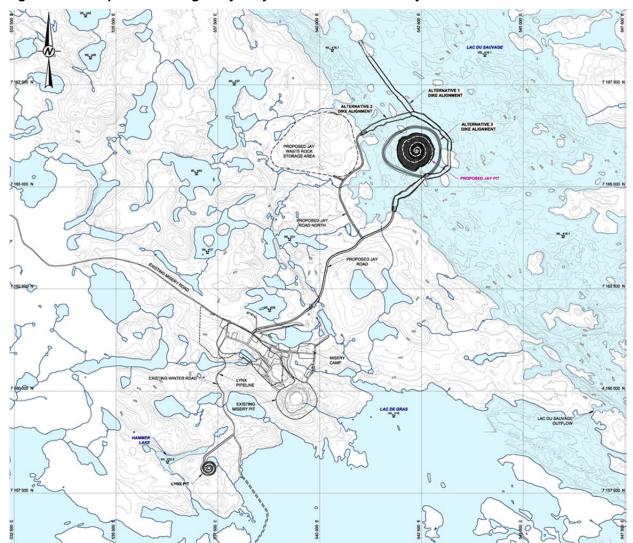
Open-Pit Mining – Jay Only Alternative General Layout
